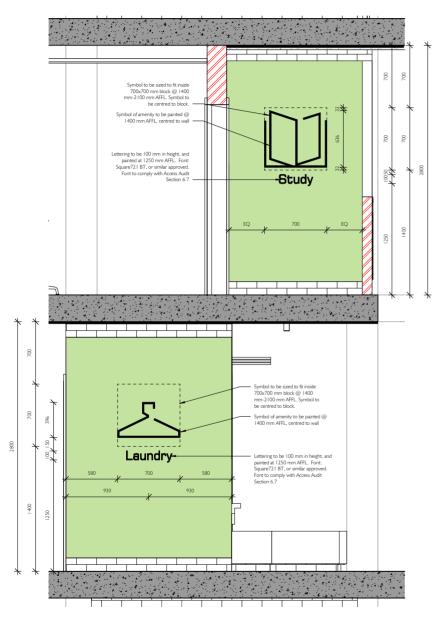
Elevation of building wayfinding signage (by Author, not tot scale)
